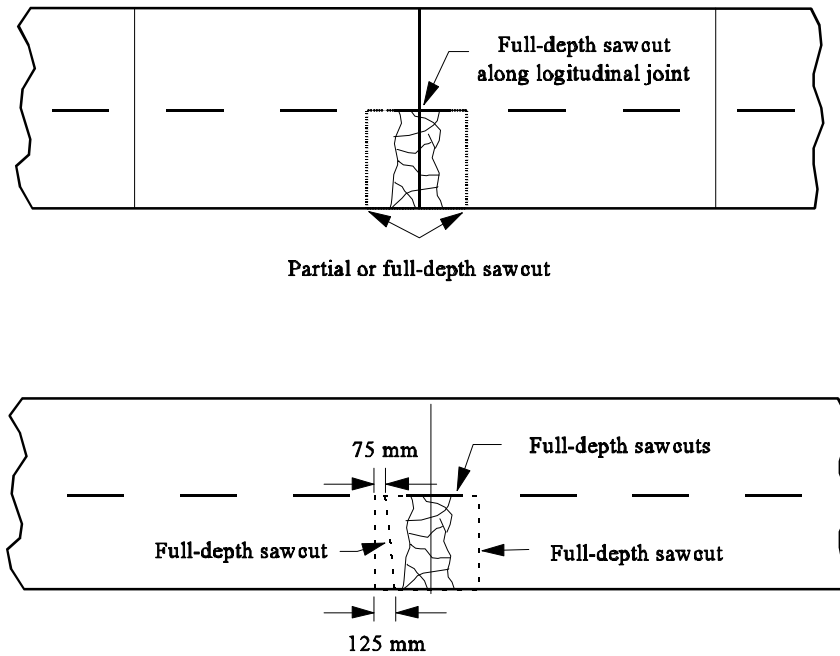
Sawcut locations for full-depth repair of jointed concrete pavements.
